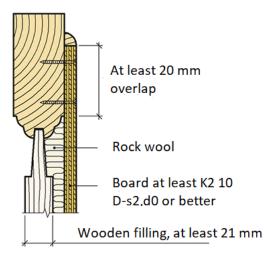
One-sided cladding on door leaves when the wood filling is at least 21 mm [4]
